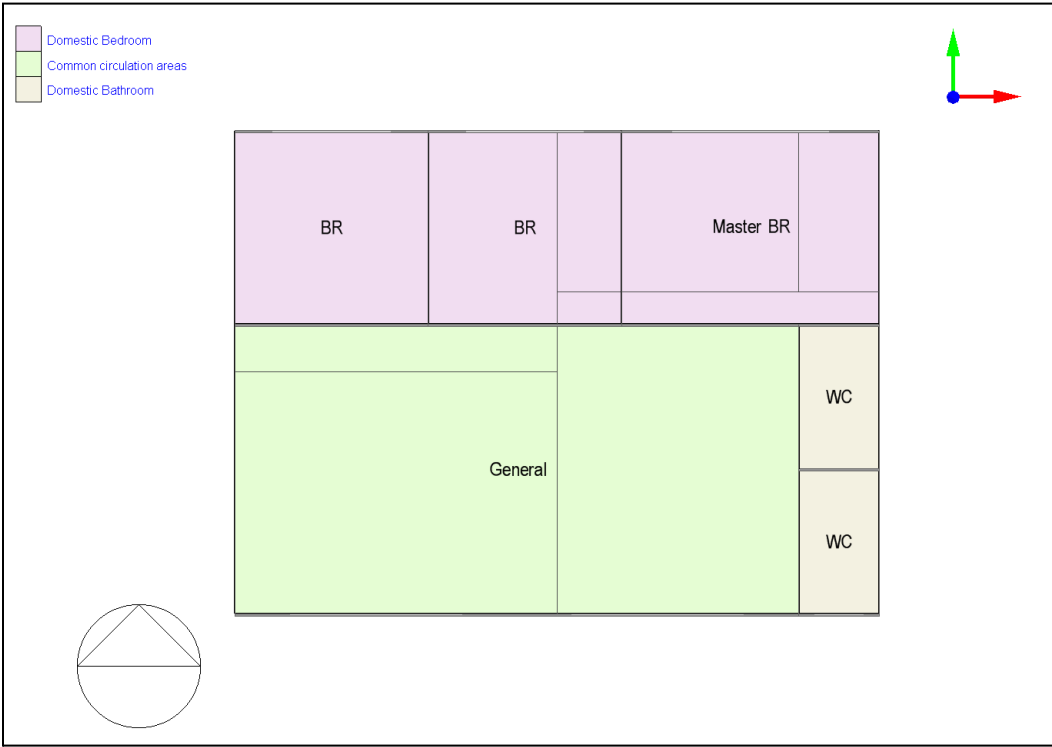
Second Floor Plan of Single Family Home in Minneapolis, MN
